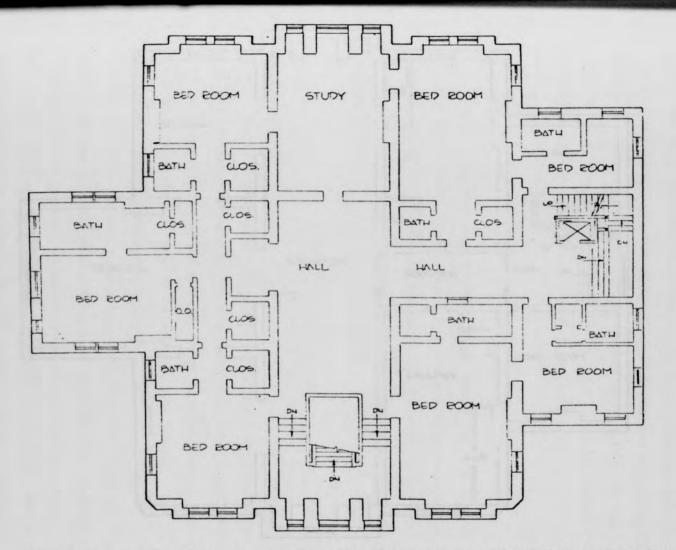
Second Floor Plan Before 1974-76 Renovation and Partial Restoration
